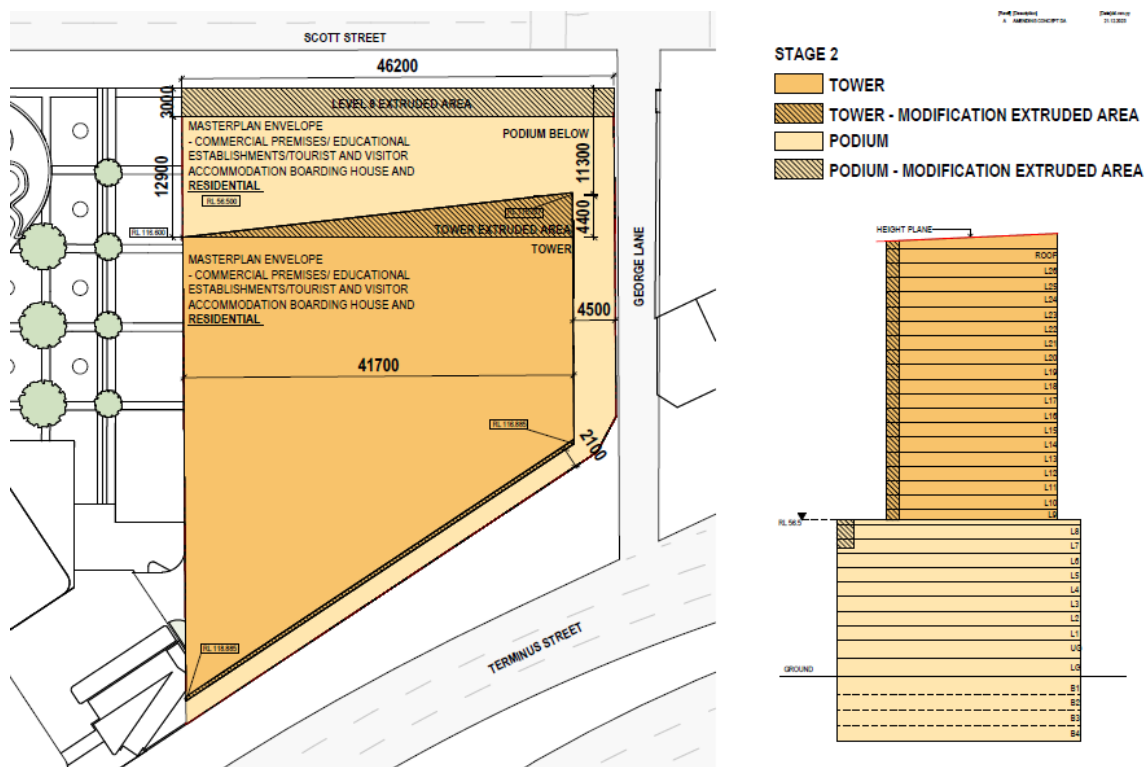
Plan of proposed Phase B building envelope showing extensions (hatched) beyond approved envelope under DA-585/2019
